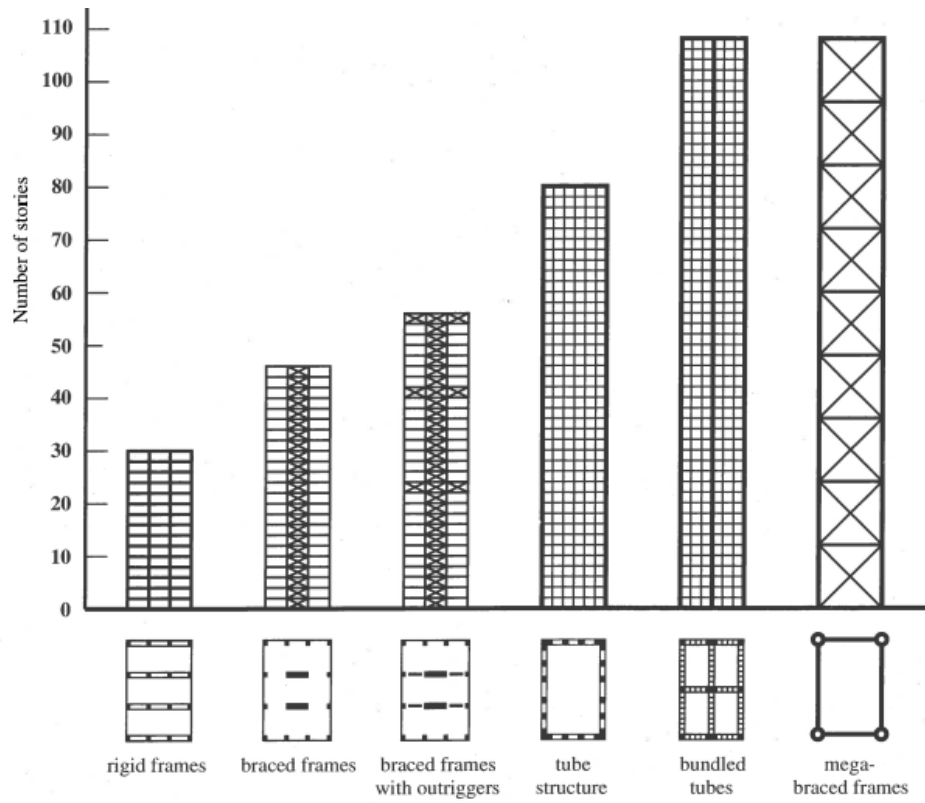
Stability systems in steel [Hoenderkamp 2007]
